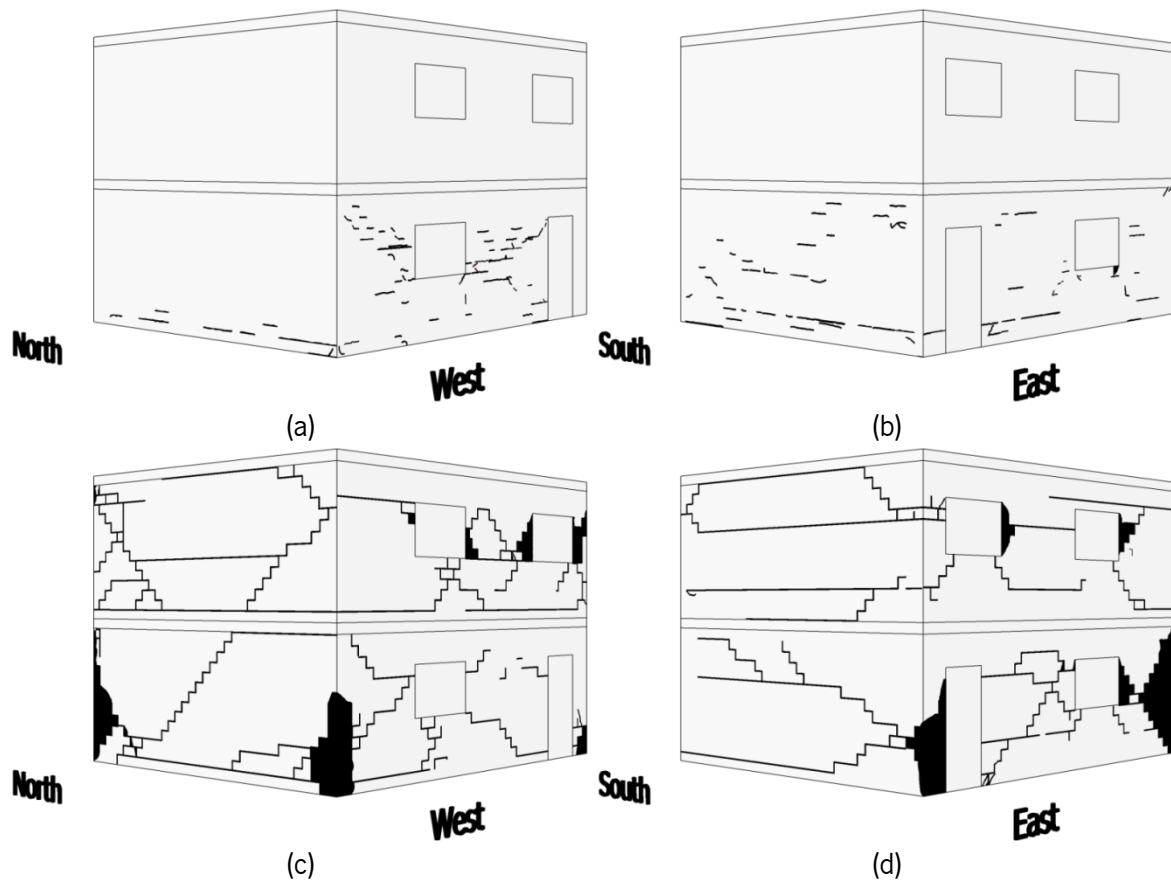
Final damage patterns in: (a, b) RM building and (c, d) UM building
